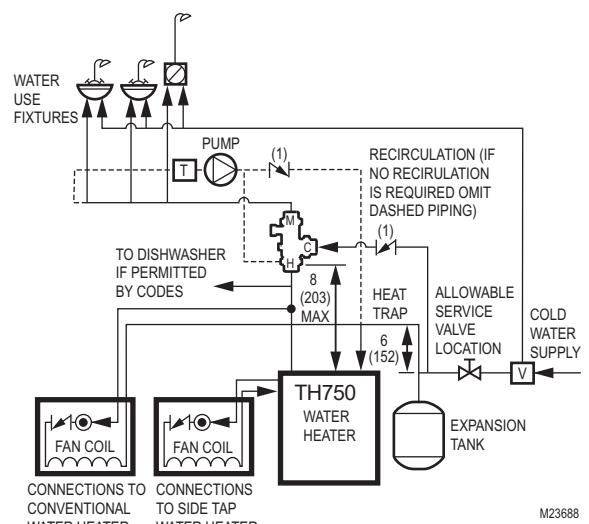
Water heater is used for domestic water and space heating. Dimensions shown in in. (mm).
